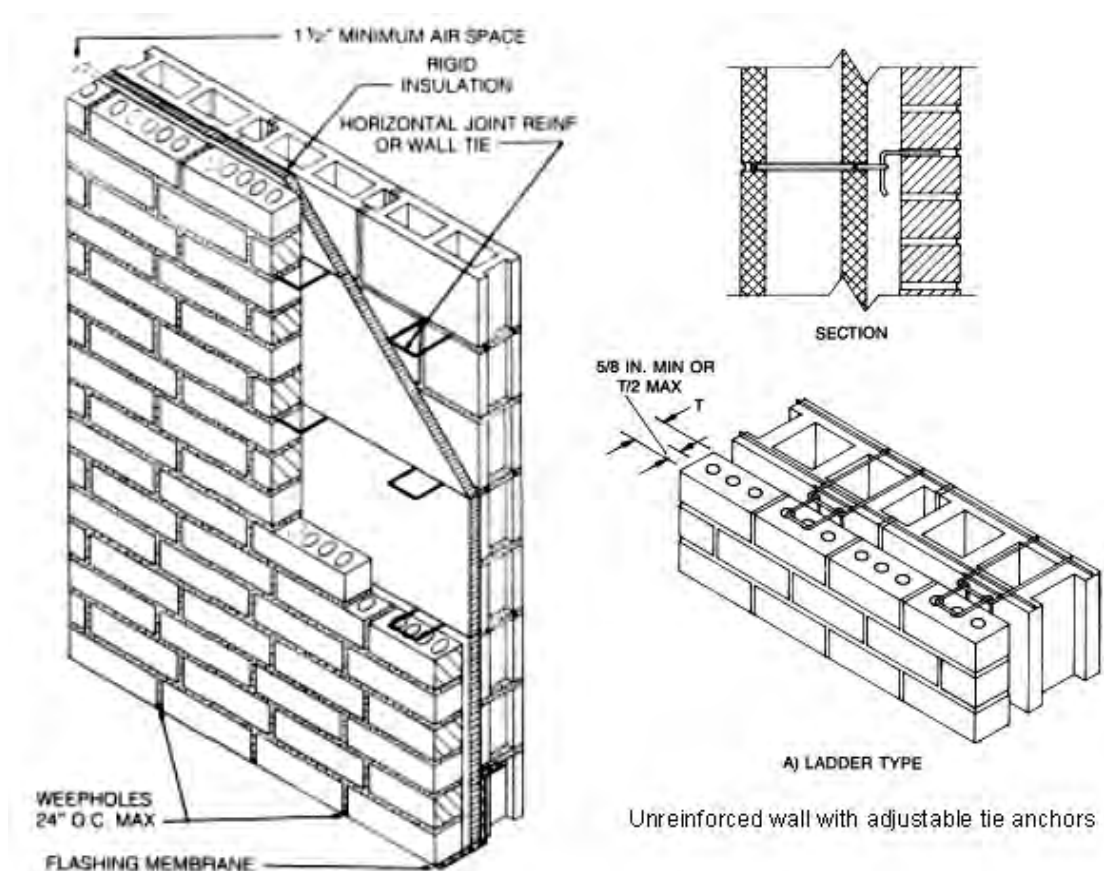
Section of a typical cavity wall from post 1980s with further insulated inner blockwork (extract from
